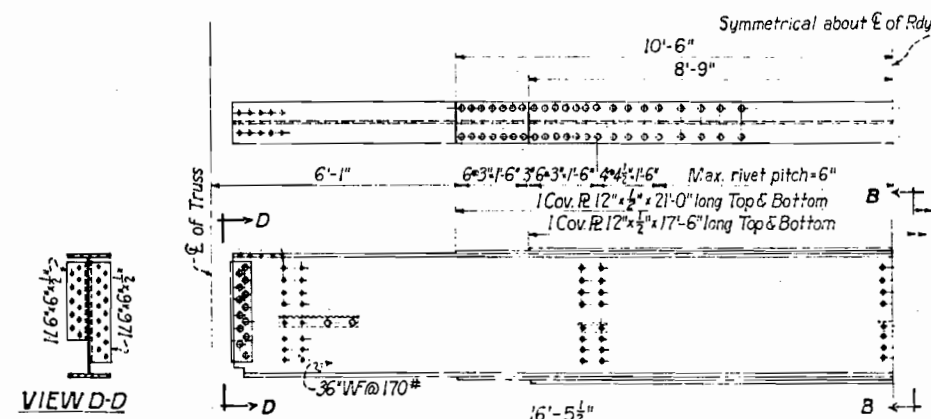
DETAIL OF GUARD RAIL FOR SOUTH TRUSS
